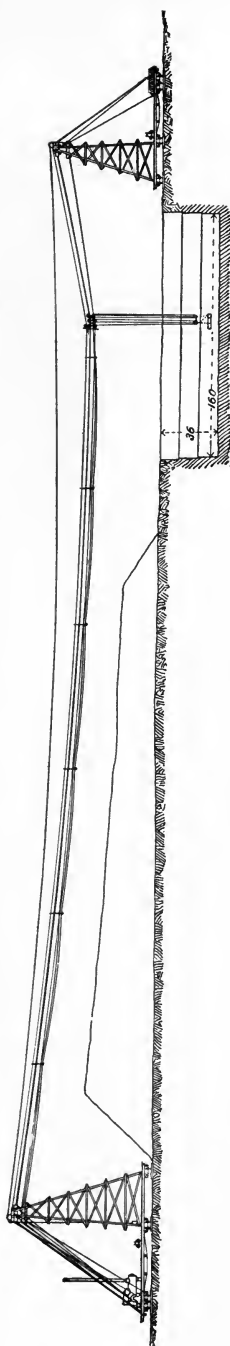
THE LIDGERWOOD TRAVELLING CABLEWAY AS USED IN THE CONSTRUCTION OF THE CHICAGO DRAINAGE CANAL.
